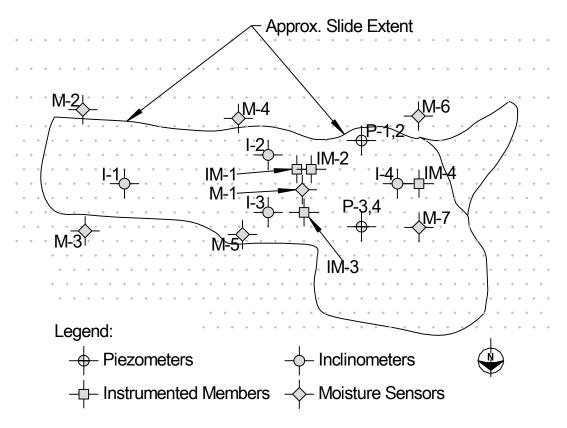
Instrumentation layout for I435-Wornall Road site.
